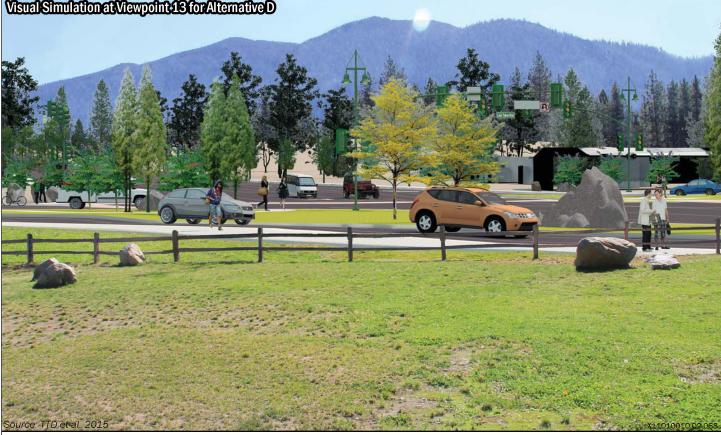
Viewpoint 13 – Existing and Proposed US 50Looking Southeast – Alternative D
